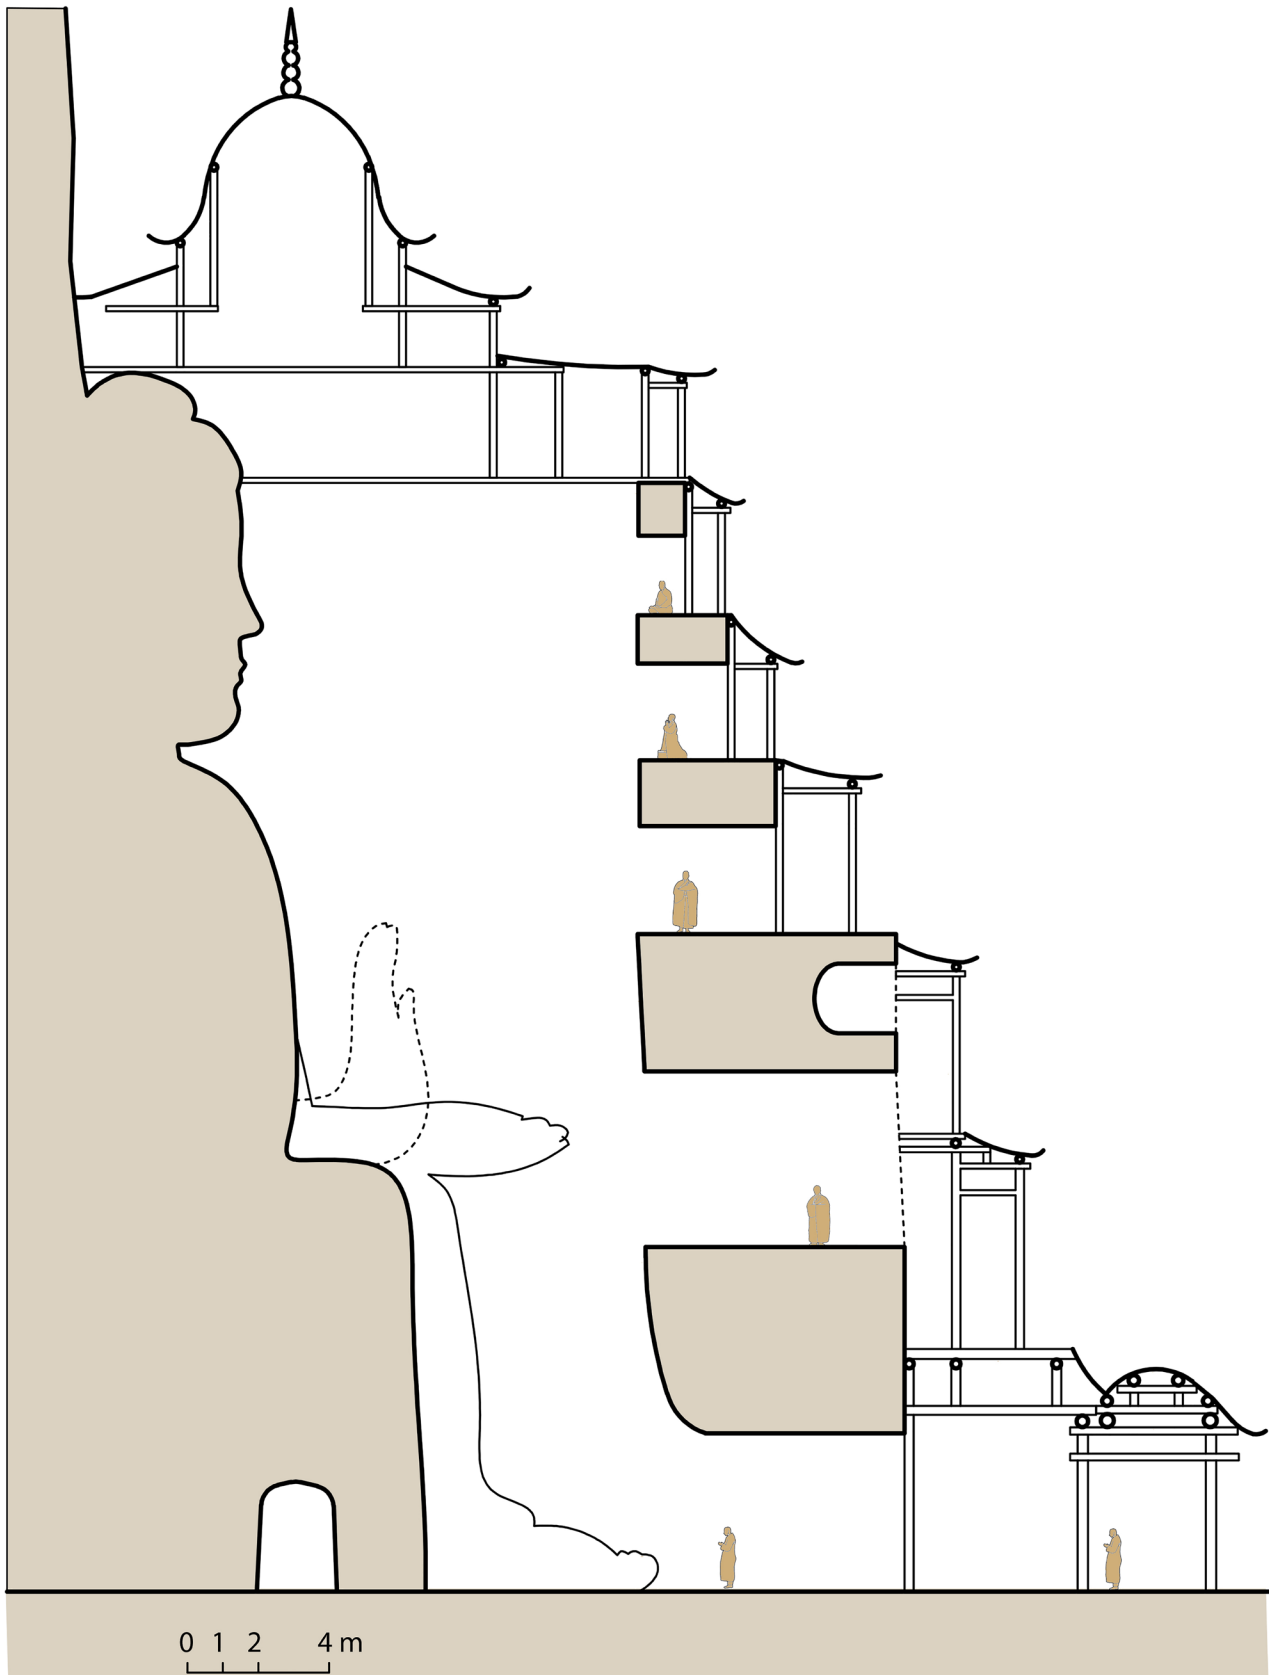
Sectional drawing of Mogao Cave 96, initially constructed in 695, façade reconstructed in 1927–35. Drawing by author.
